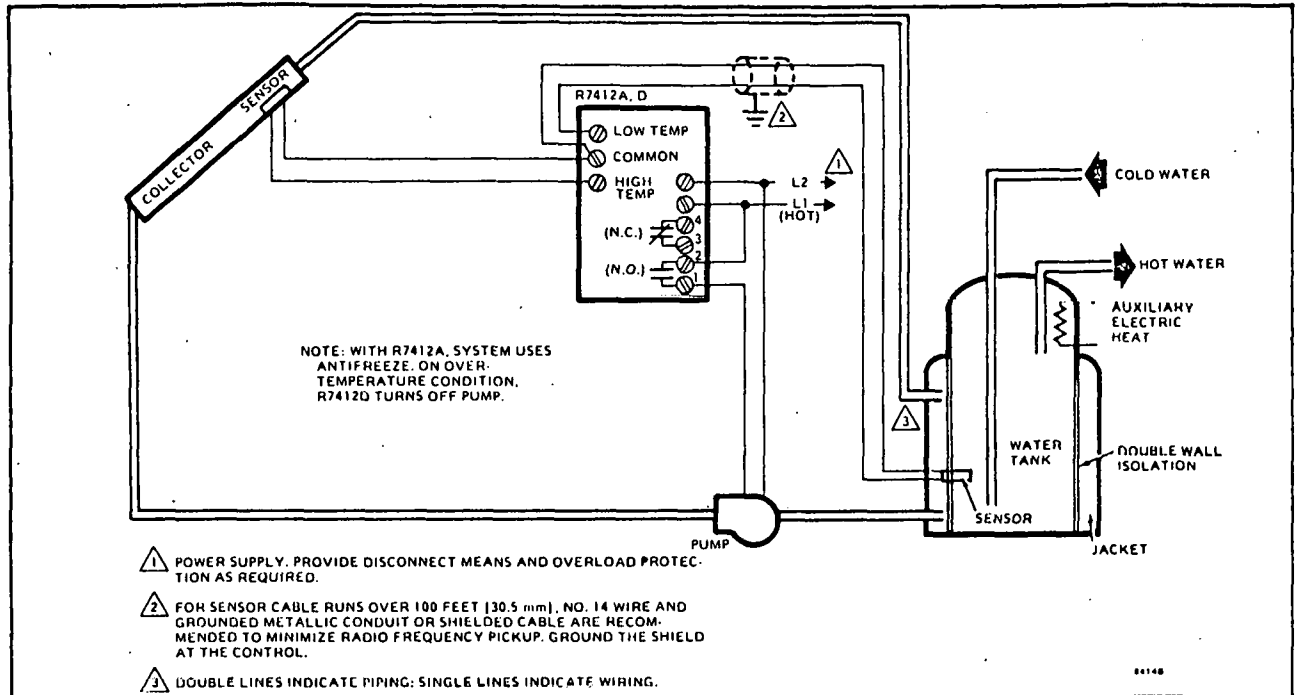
USING THE R7412A,D WITH A SOLAR WATER HEATER.
